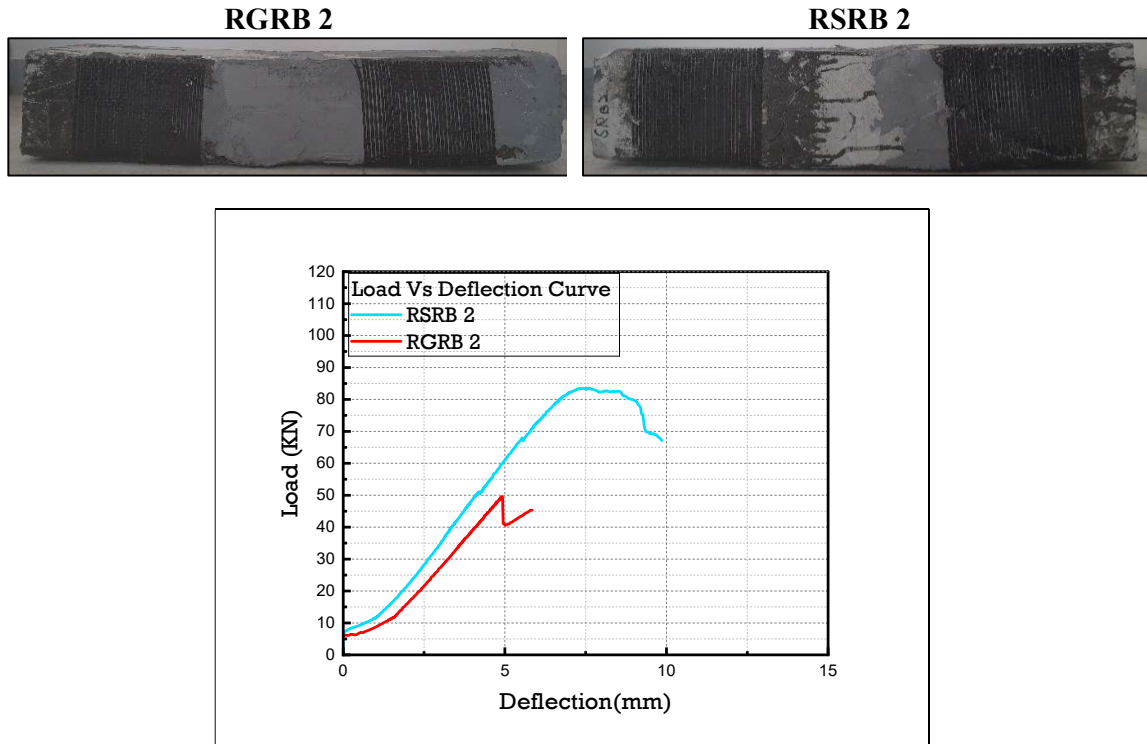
Comparison between Steel reinforced beams and GFRP reinforced Beams (RGRB 2 vs RSRB 2)
